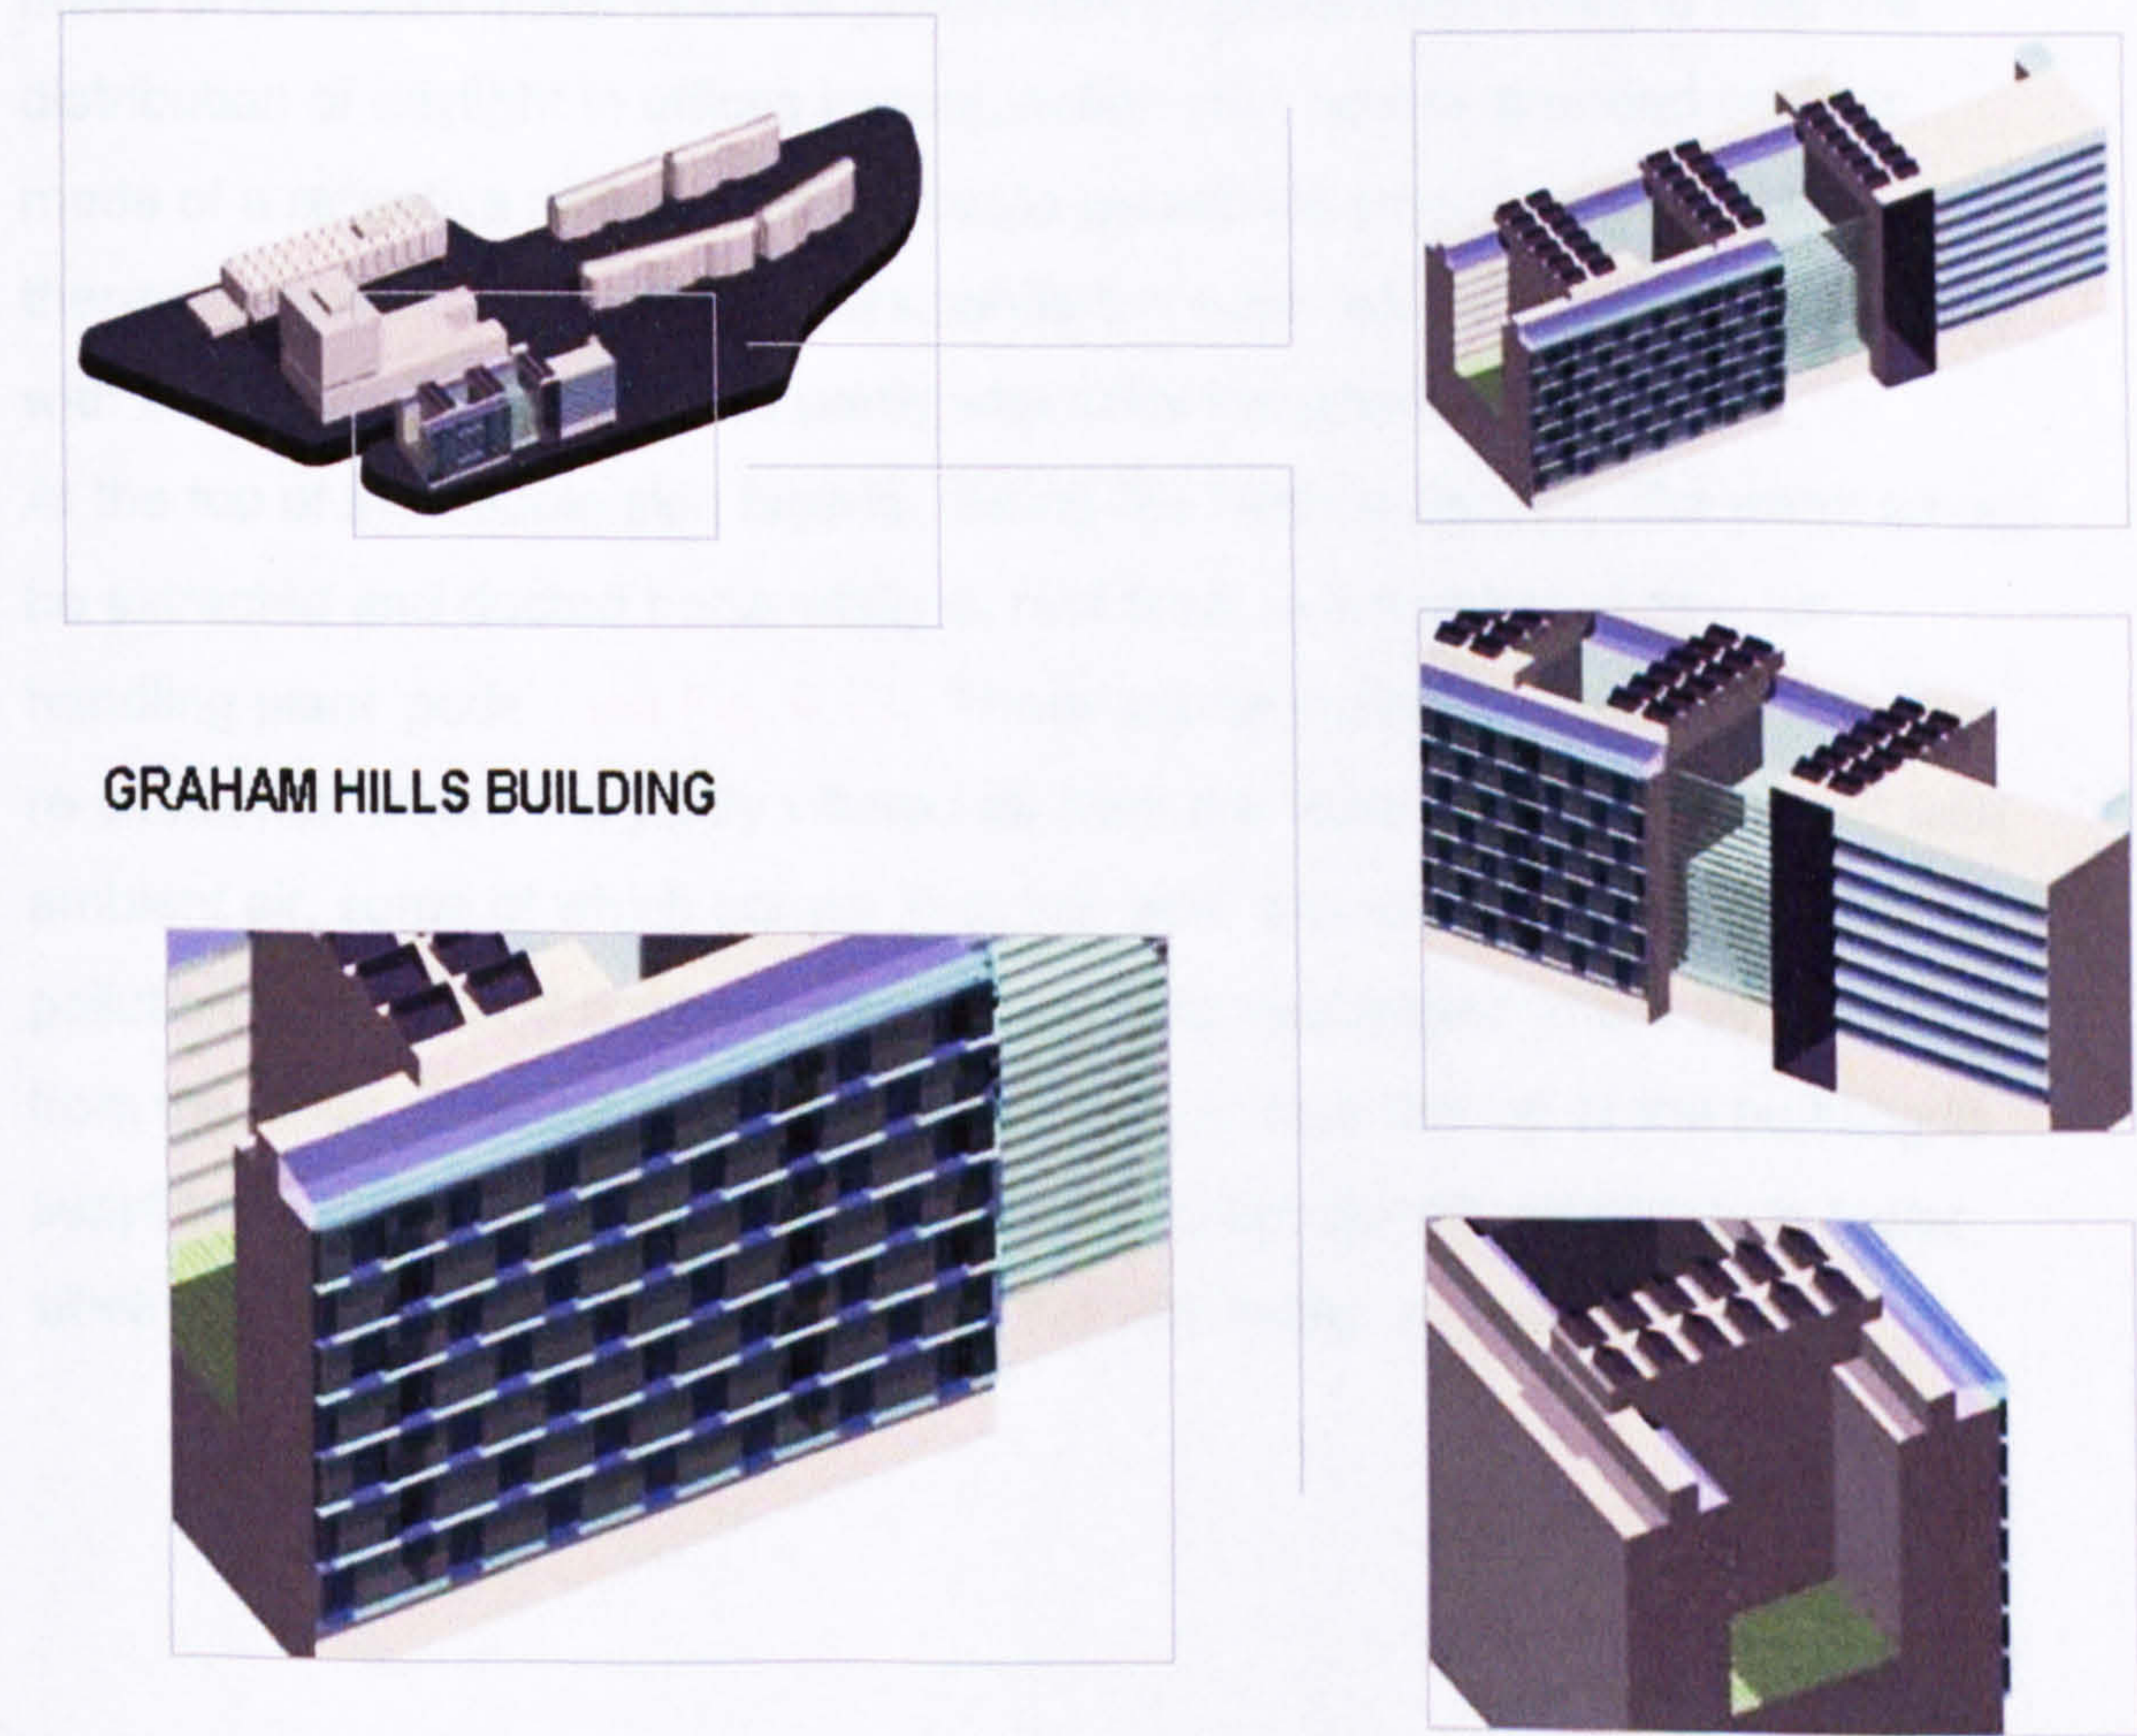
Graham Hills building double skin façade 3D modelling [BIPV panels in front of existing concrete panels]
